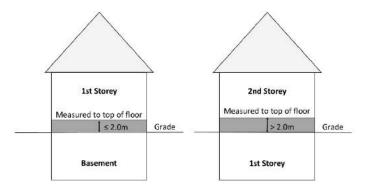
Determining the number of storeys in a building. The building to the left is considered a one-storey building as the top of the upper floor is no more than 2.0m above grade. The building to the right is considered a two-storey building as the top of the upper floor is more than 2.0m above grade.
